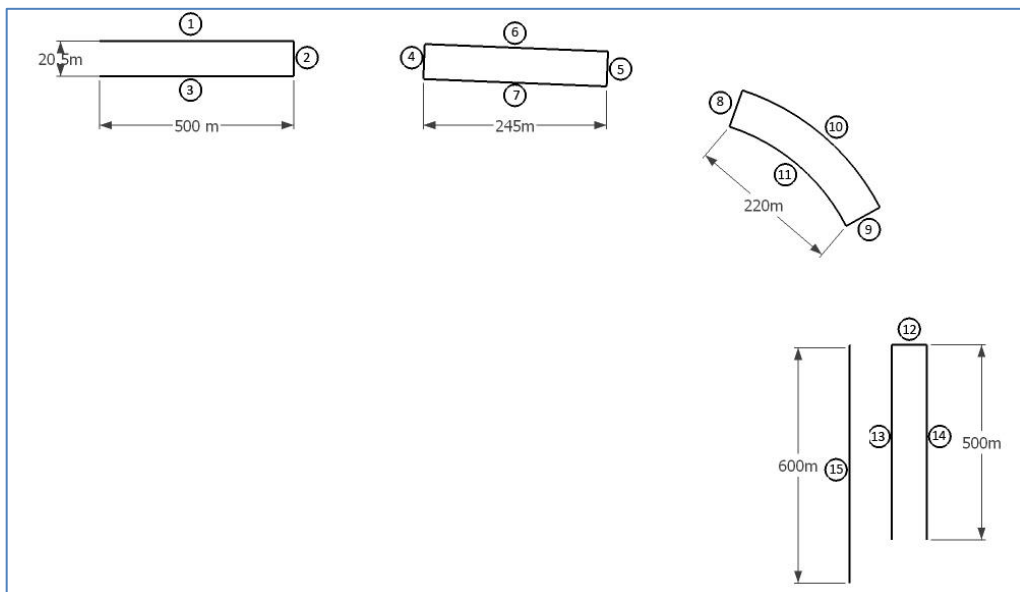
1Lengths and alignments of 15 MSE walls (not in scale)
